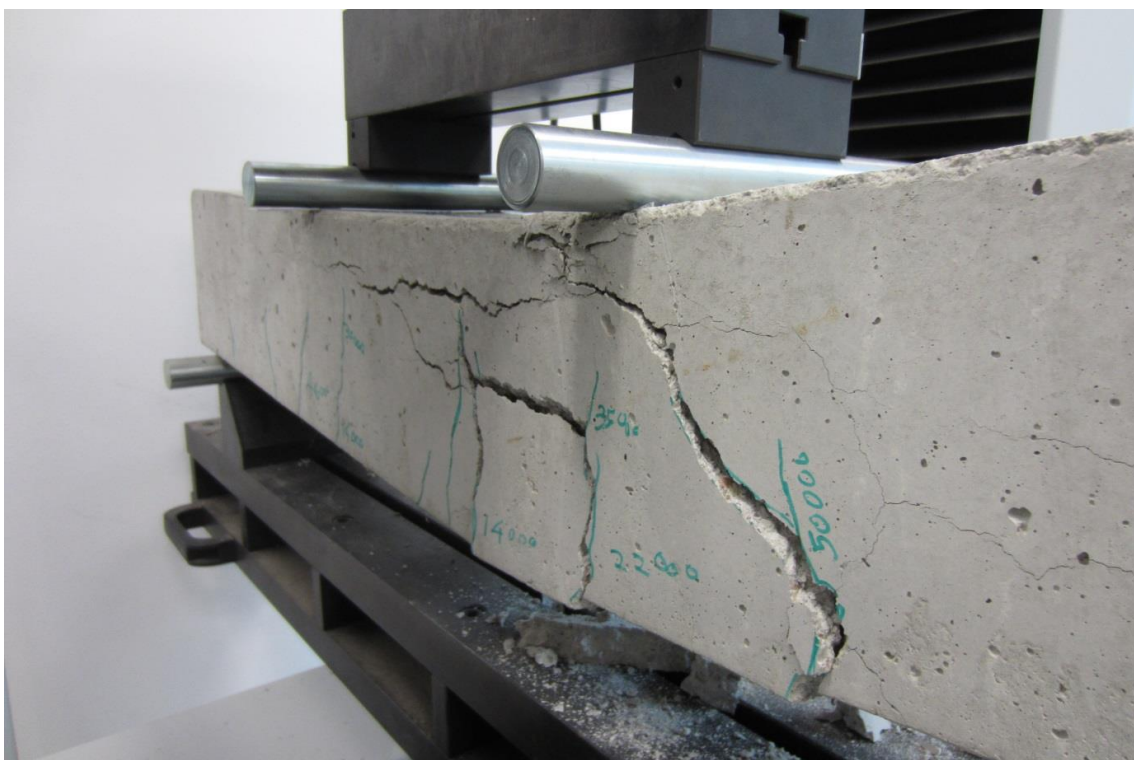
Shear failure of concrete beam from B5b3 series
